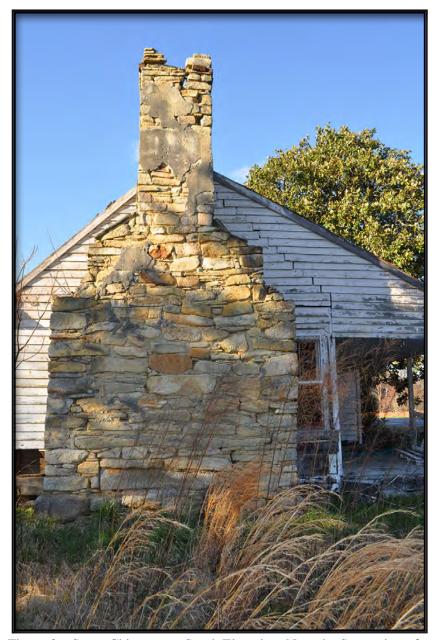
Stone Chimney on South Elevation, Note the Separation of Weatherboards Where Shed Porch has been Added
